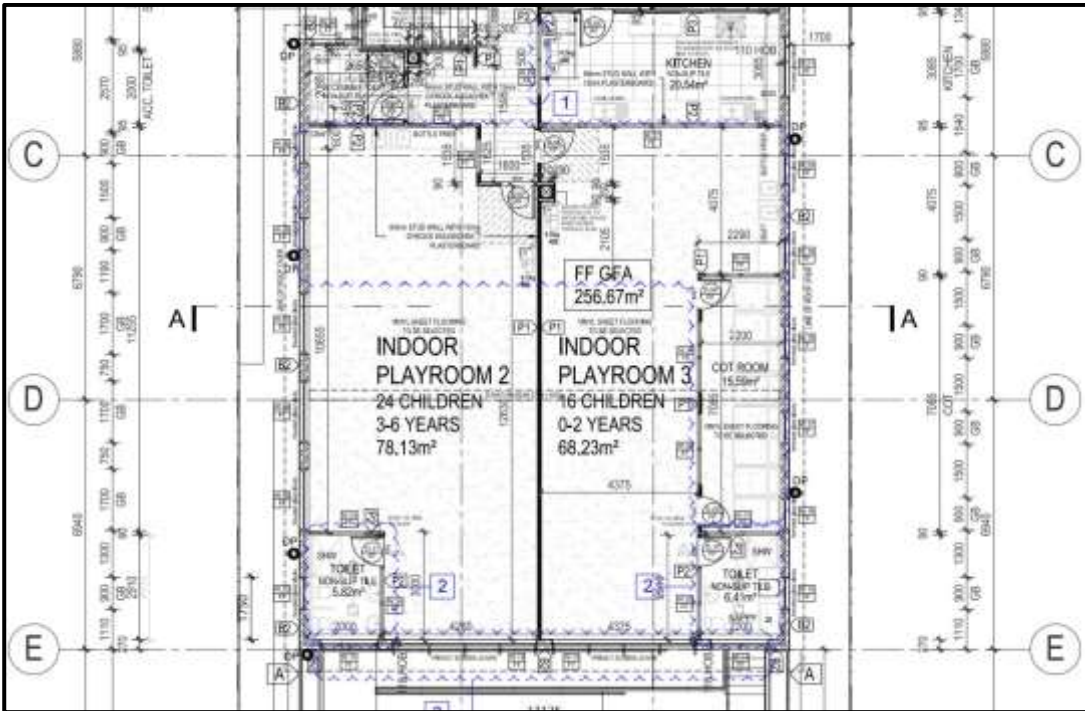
Proposed changes to first floor – including layout and use of playrooms and bathrooms and window changes along the side and rear elevations.
